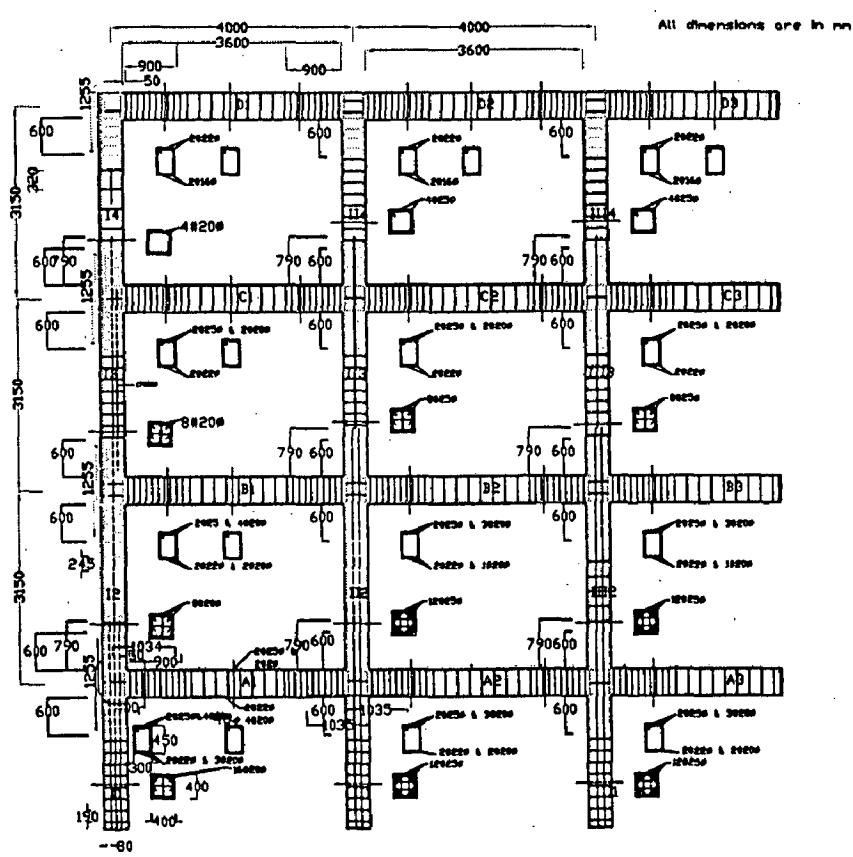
Details of beam and column reinforcement of interior frame for Zone V
